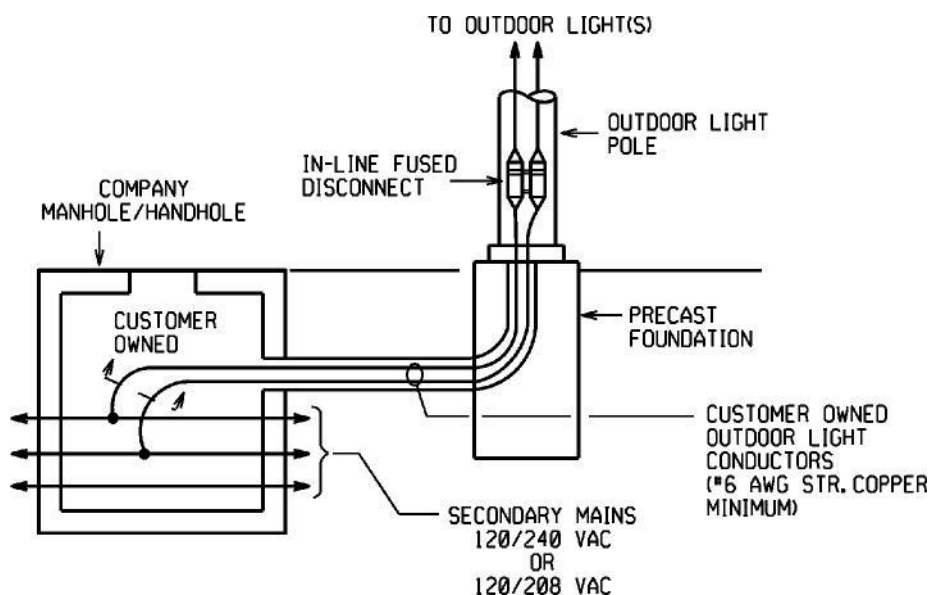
Connection of Underground Supplied Customer Owned Outdoor Light to National Grid Handhole or Manhole – Non-Standard Connection
